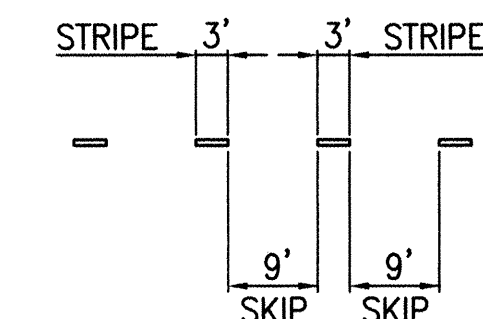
TYPICAL MULTI-LANE
